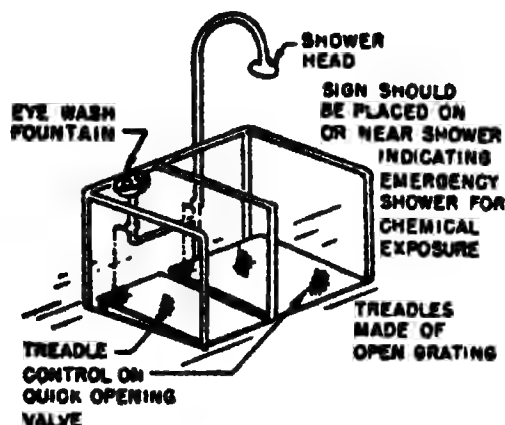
TYPICAL EMERGENCY SHOWER AND EYE WASH FOUNTAIN.
